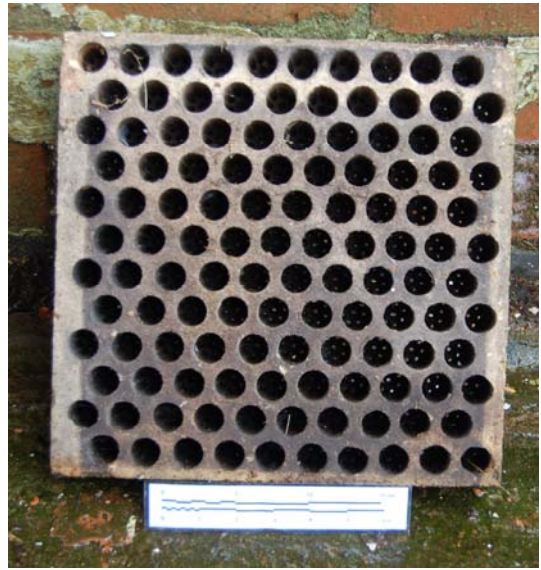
[2F02]; detail of u/s of wedge-wire kiln floor.
